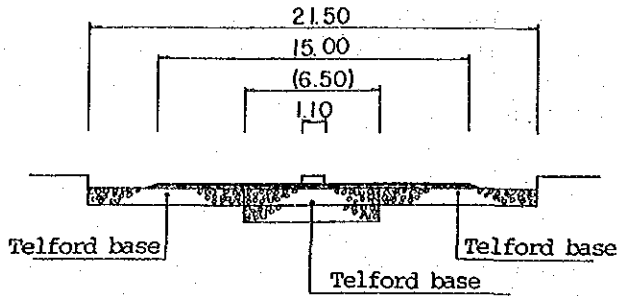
PAVEMENT STATUS OF R. DE FRANCIA AVENUE
